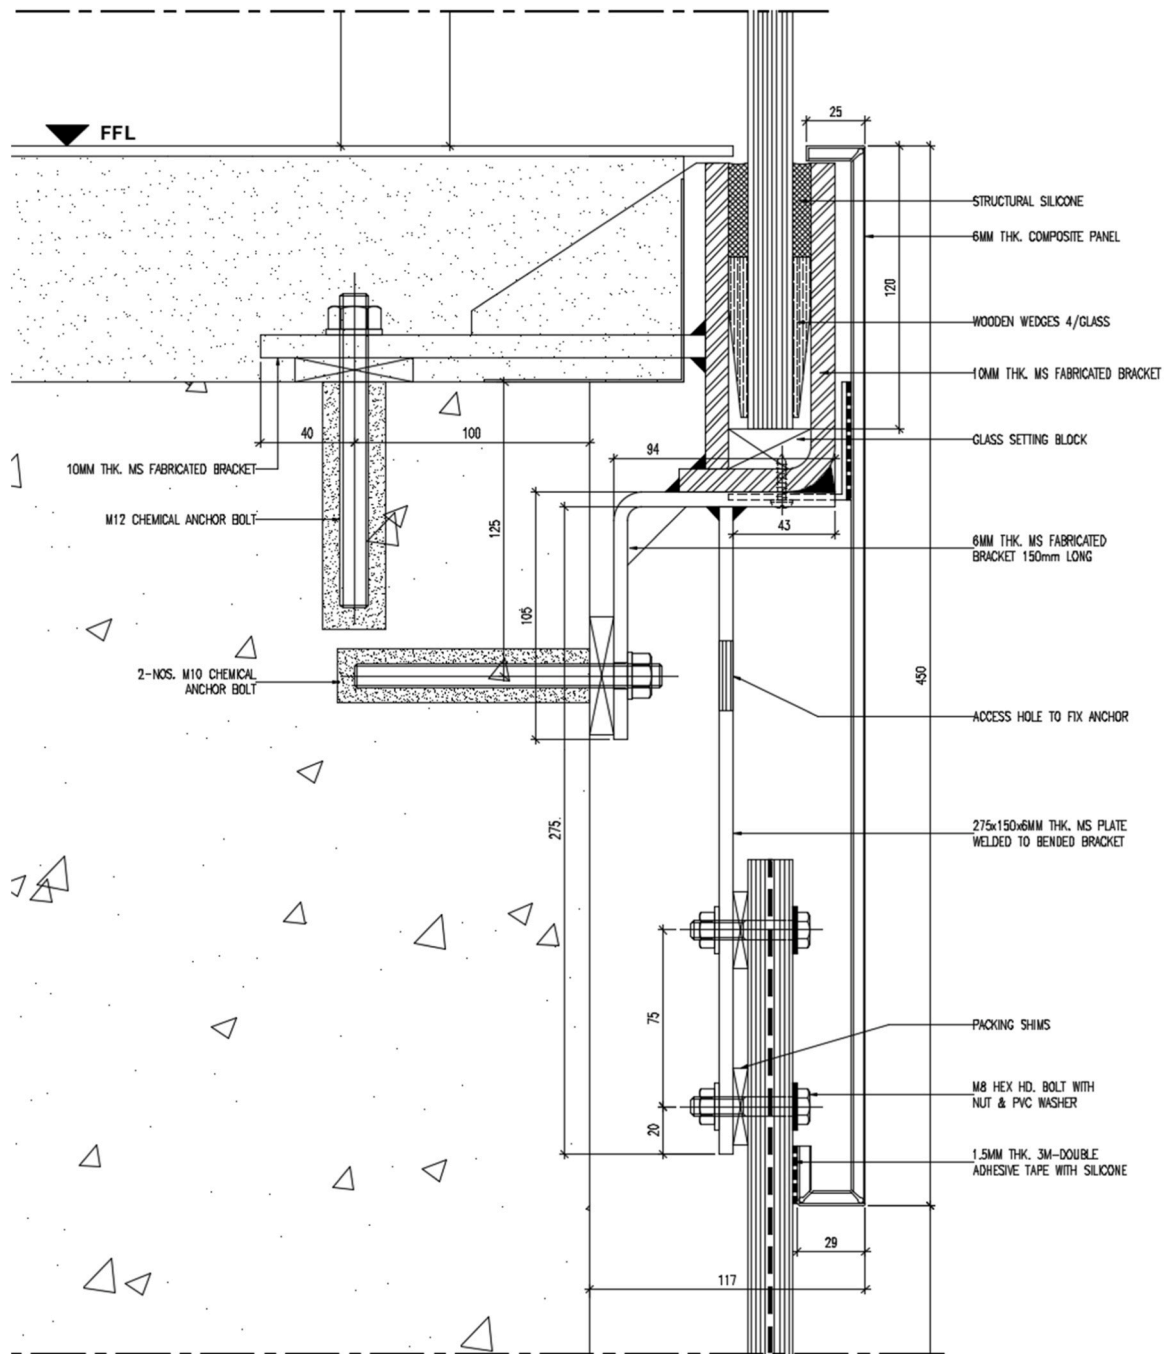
Cross-section view of the frameless balustrade and fixing details.
